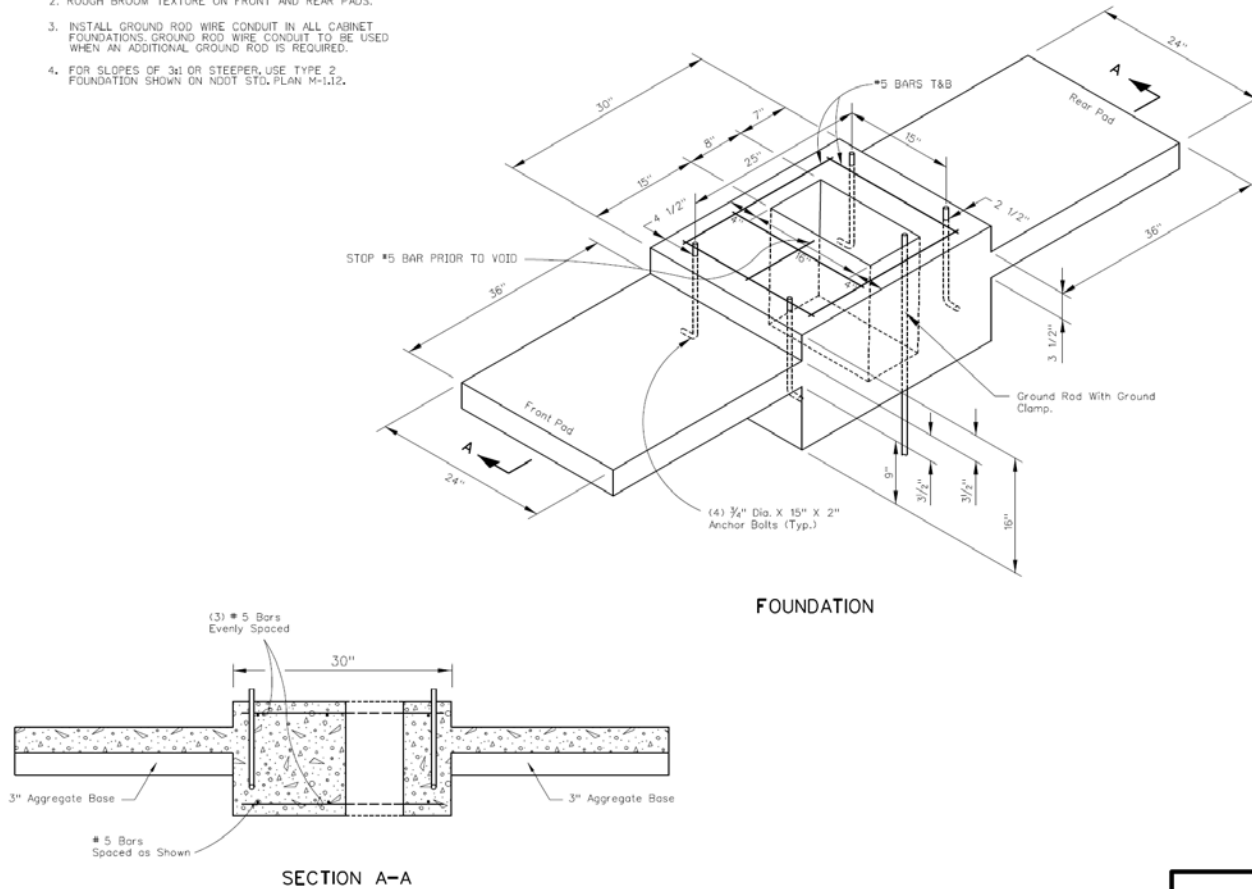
Typical Controller Cabinet Detail: Foundation
